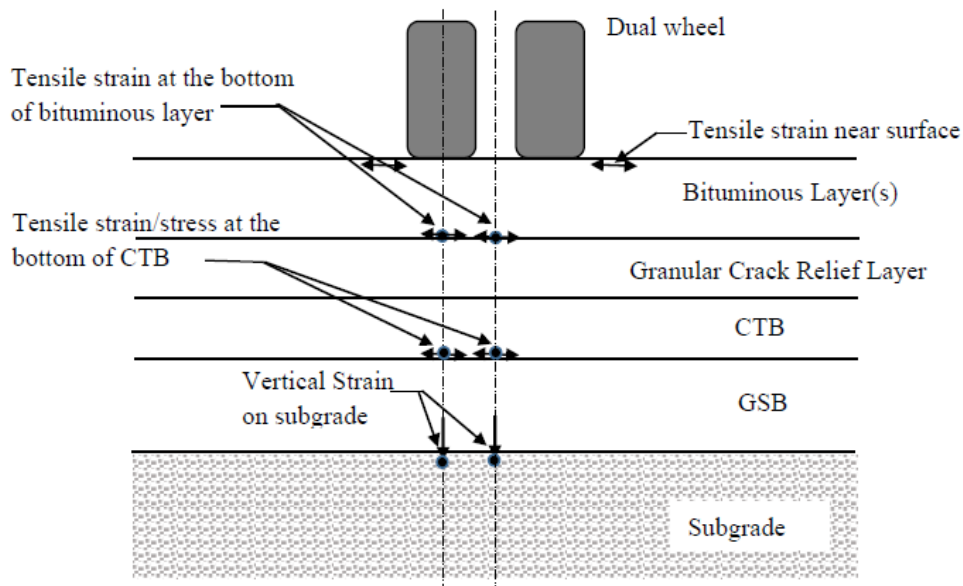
A pavement section with bituminous layers(s), granular crack relief layer, CTB and GSB showing the locations of critical strains. (IRC: 37-2018)
